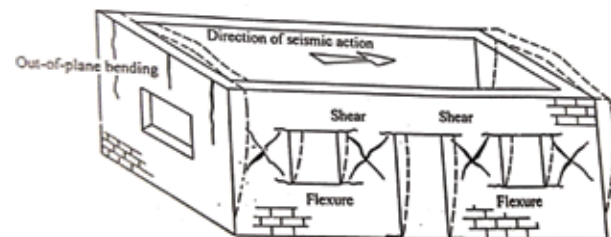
Typical Modes of Failure/ Damages to Masonry Walls (Ref. 4 pp. 31)
